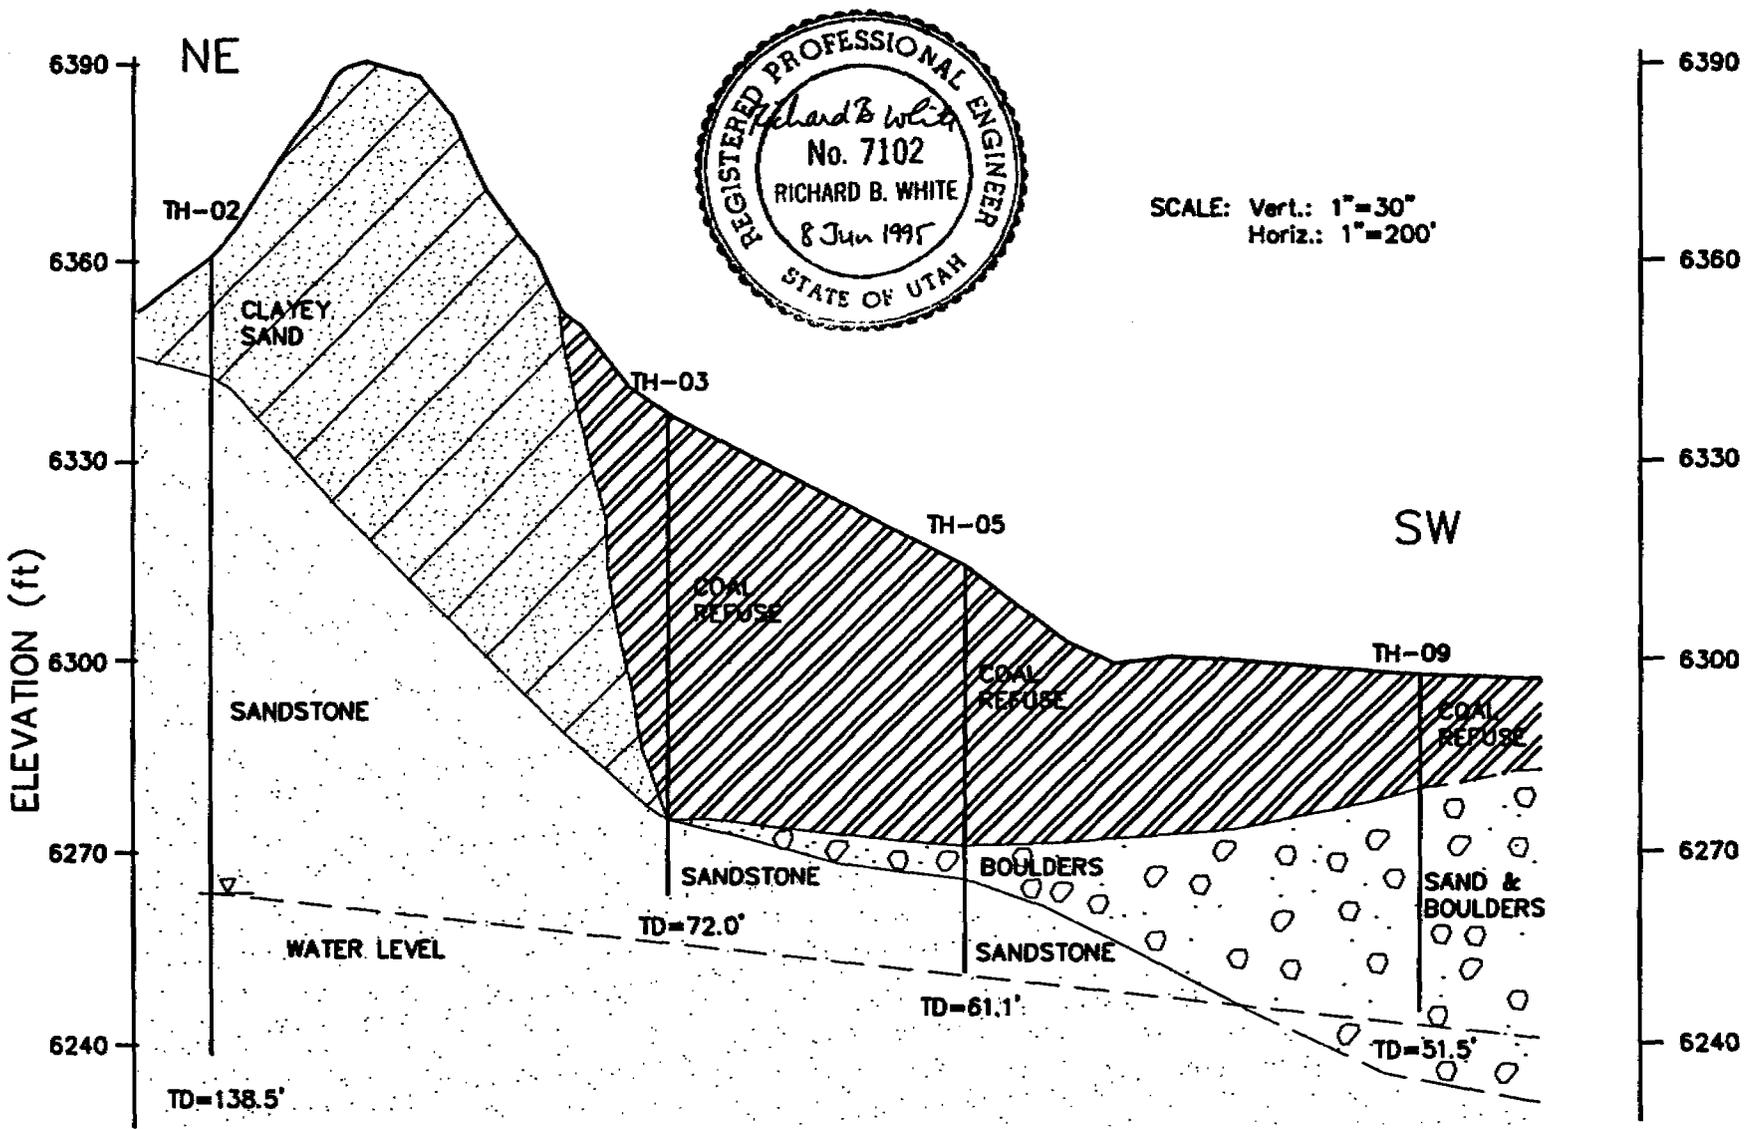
DRILLHOLE CROSS SECTION
